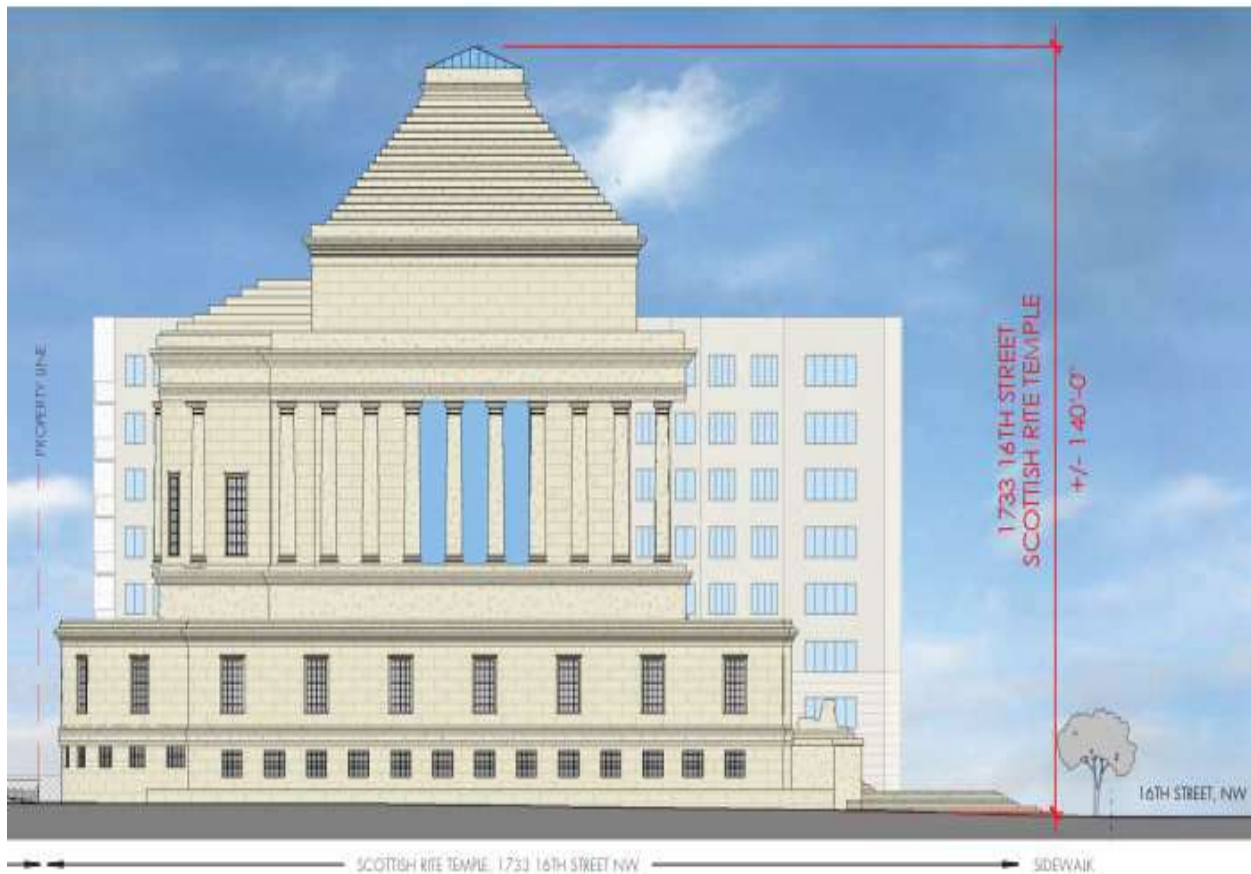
above shows the Temple from S Street NW looking south towards the Temple building. There is no entranceway (and never has been any entranceway) on the S Street side of the Temple.
